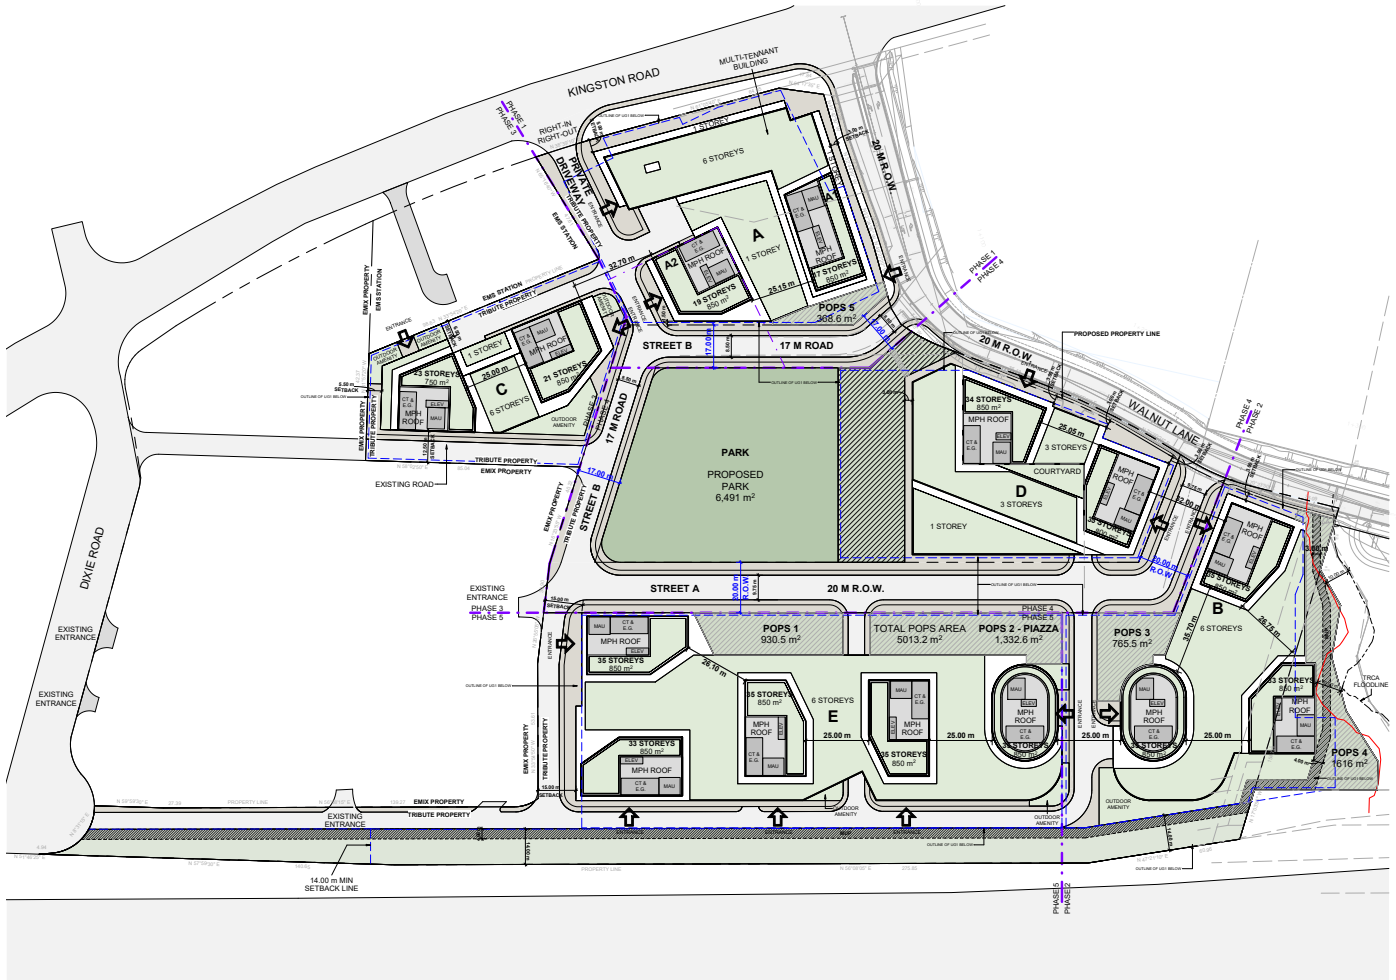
Site Plan / Roof Plan, created by Turner Fleischer Architects
